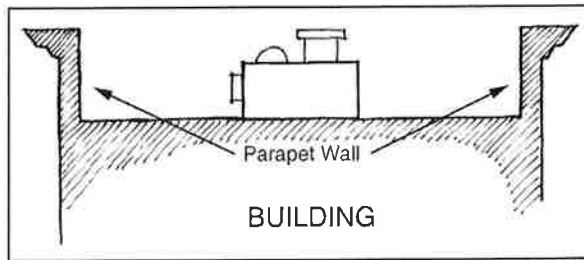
Example of how parapet walls are utilized to screen roof mounted mechanical equipment.
